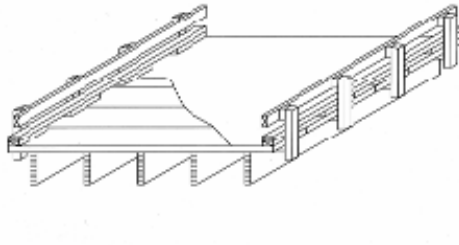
Common American bridge with glulam stringers and transverse glulam deck
